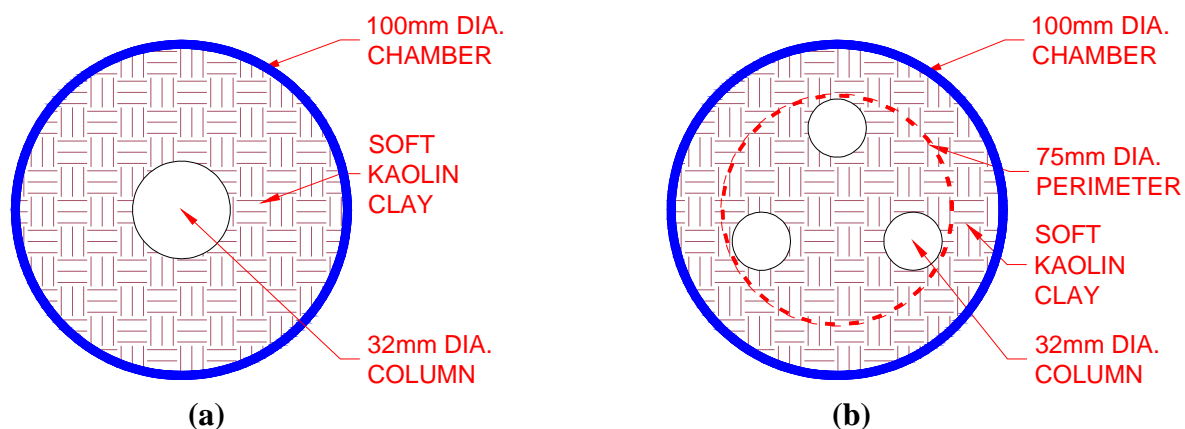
Column arrangement for (a) single pier and (b) group of three piers (reproduced per Black et al., 2007b)
